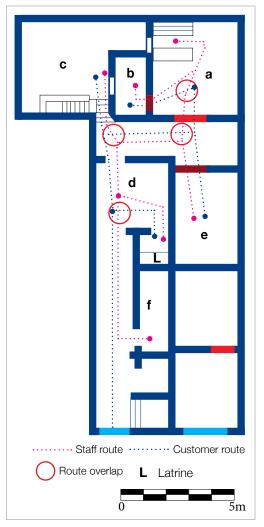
Type 3 floor plan at IV.2.6 Ostia, with potential traffic routes.
